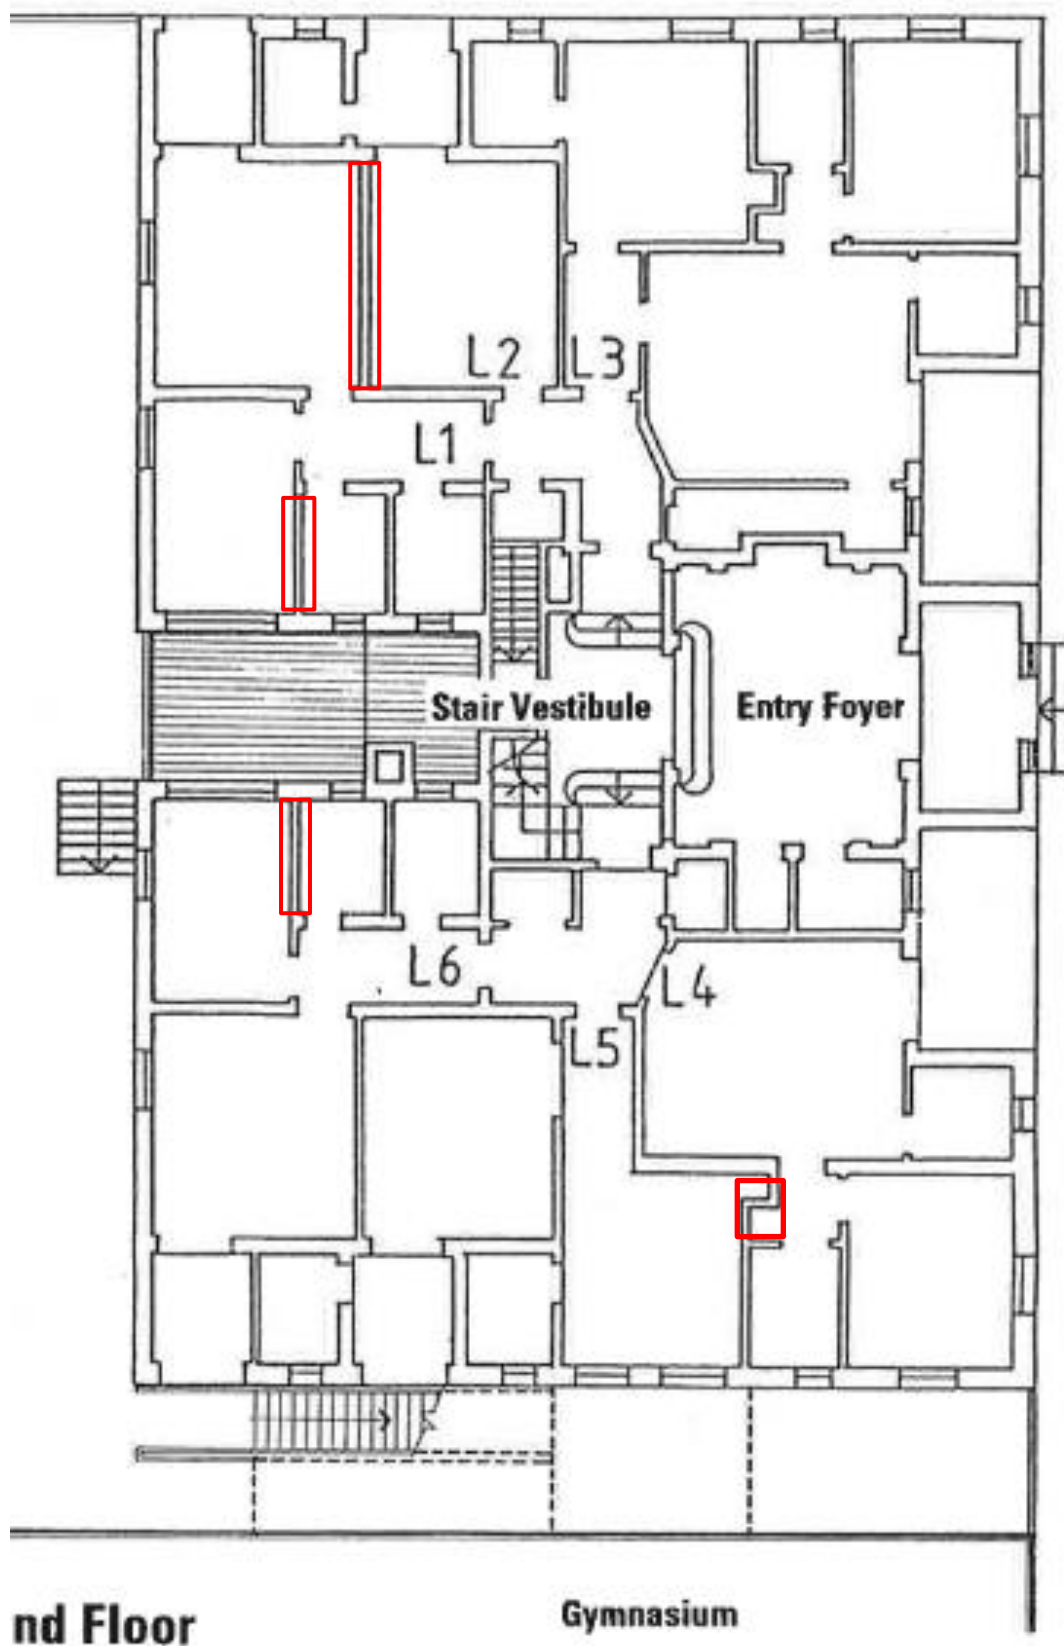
Ground level plan of Wilkinson House in 2001, as compiled in the 2001 GML CMP. Demolished walls have been highlighted in red.
